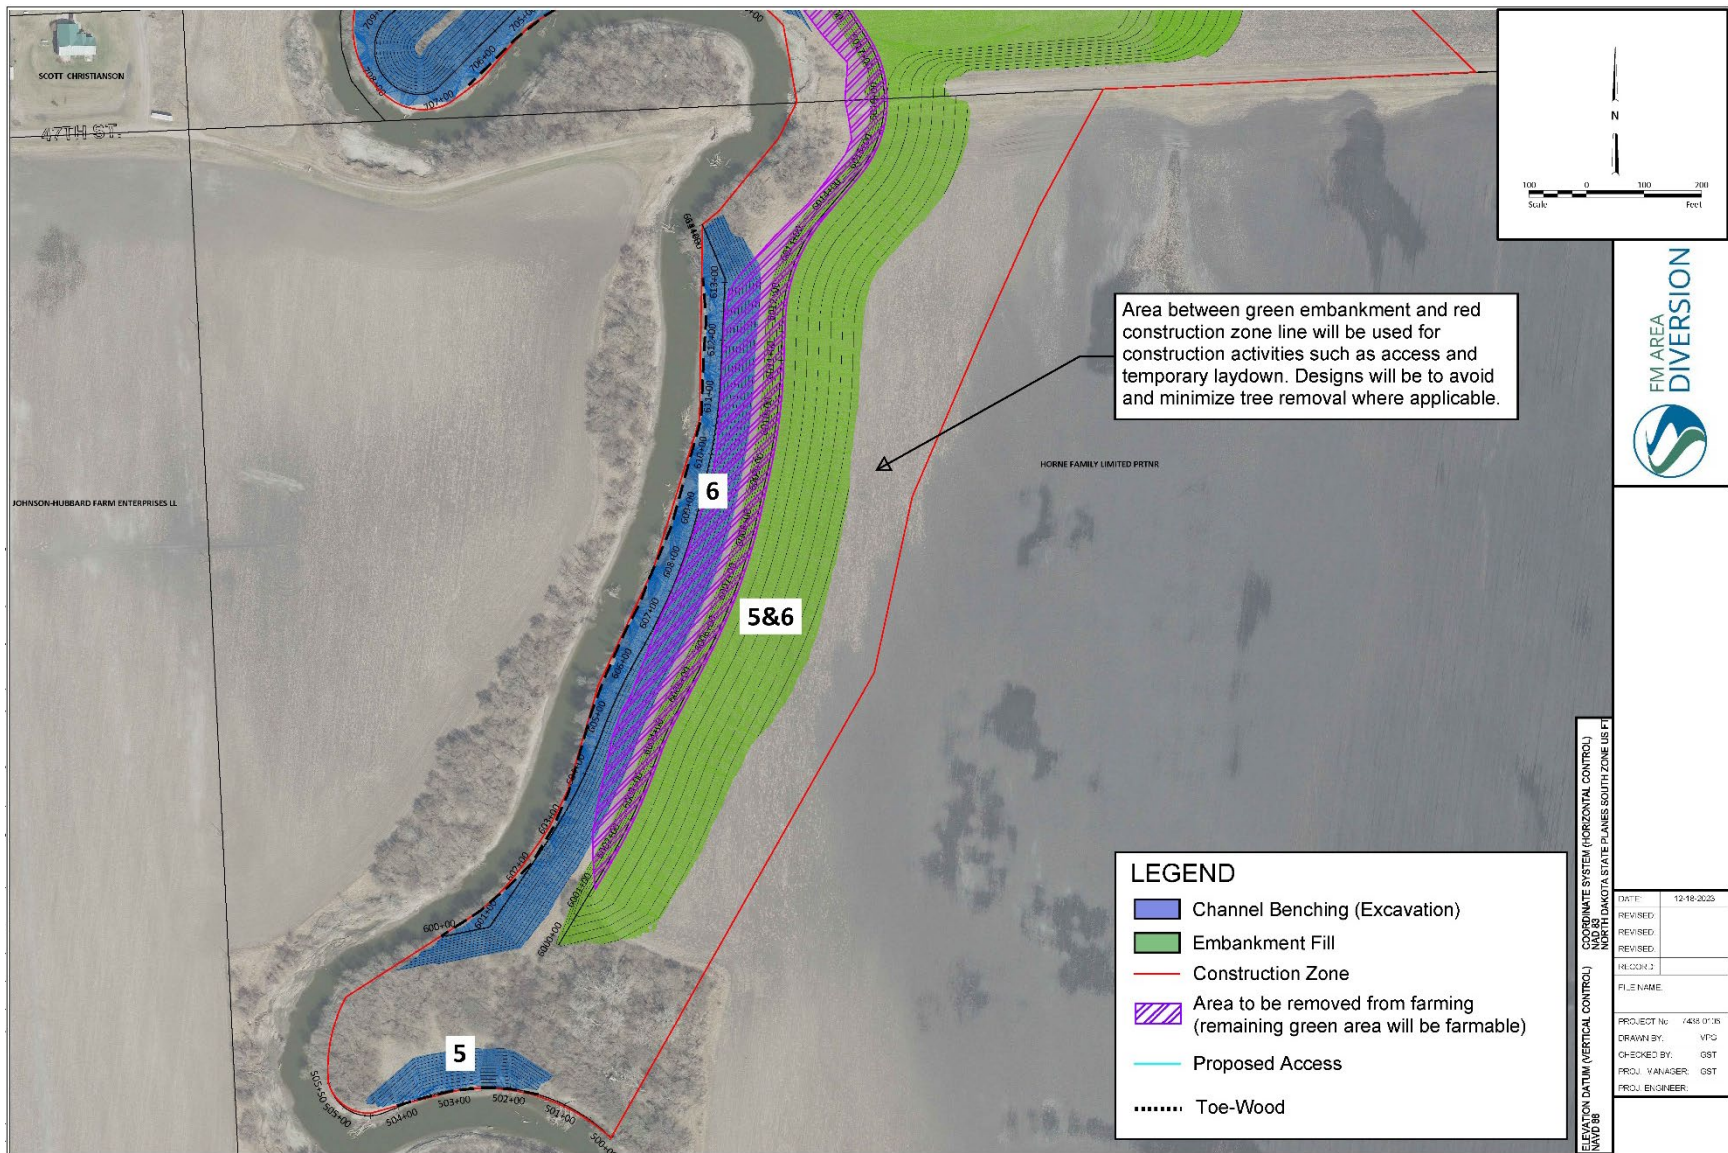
Sheyenne River Proposed Alternative Benching Detail (Figure 2 of 4)
